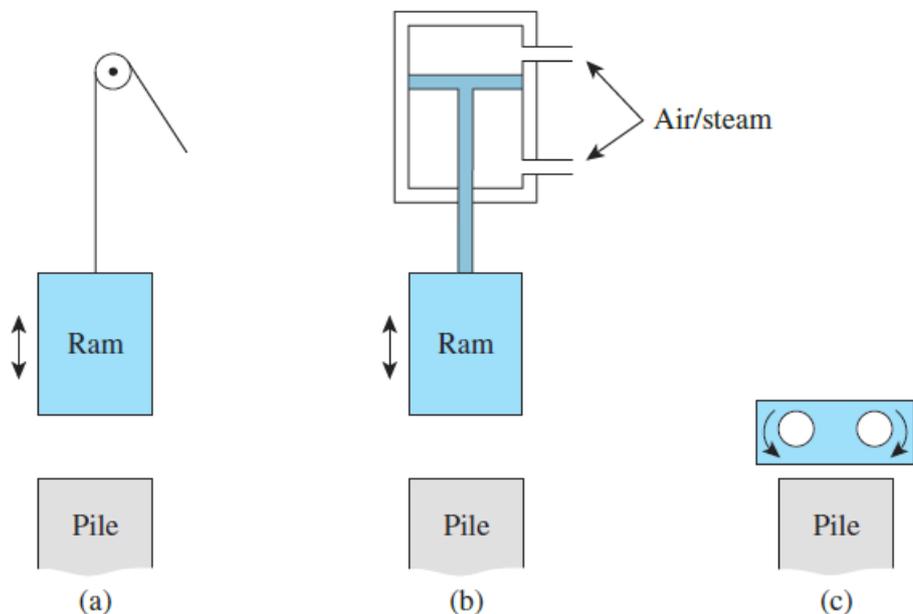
Pile-driving hammers: (a) drop hammer; (b) pneumatic hammer; (c) Vibratory hammer
